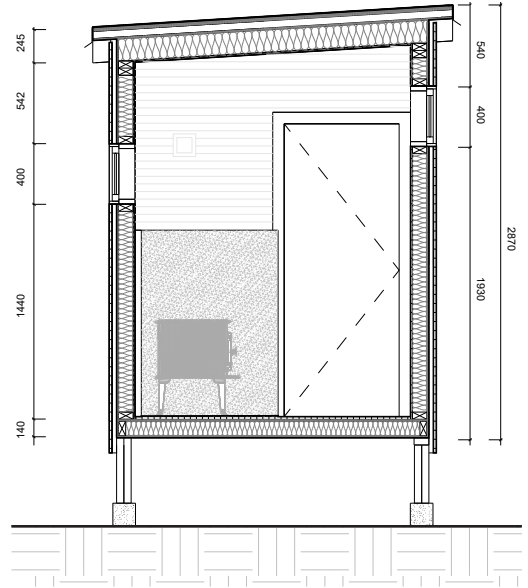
SECTION D-D OF THE BUILT CABIN.
